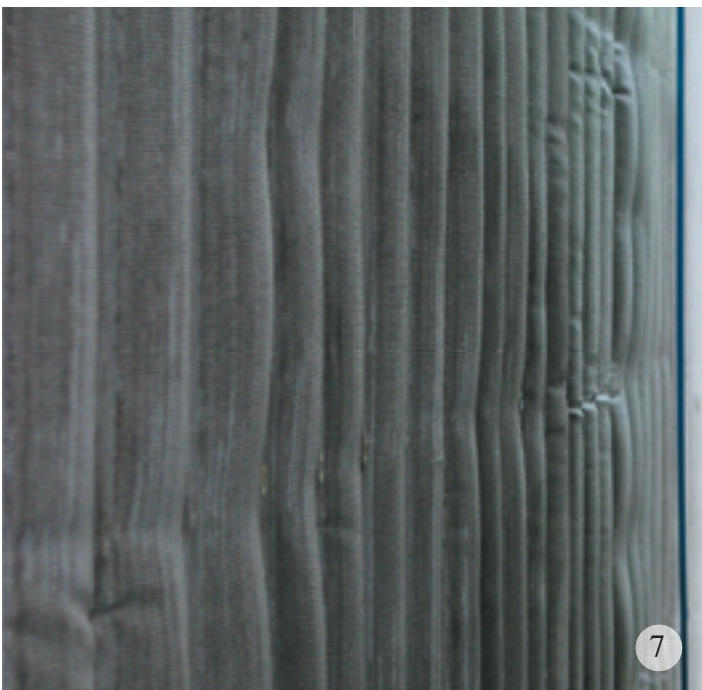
shows the undulating surface texture produced by this technique on the exterior of wall of Shunji Kondo's building.
